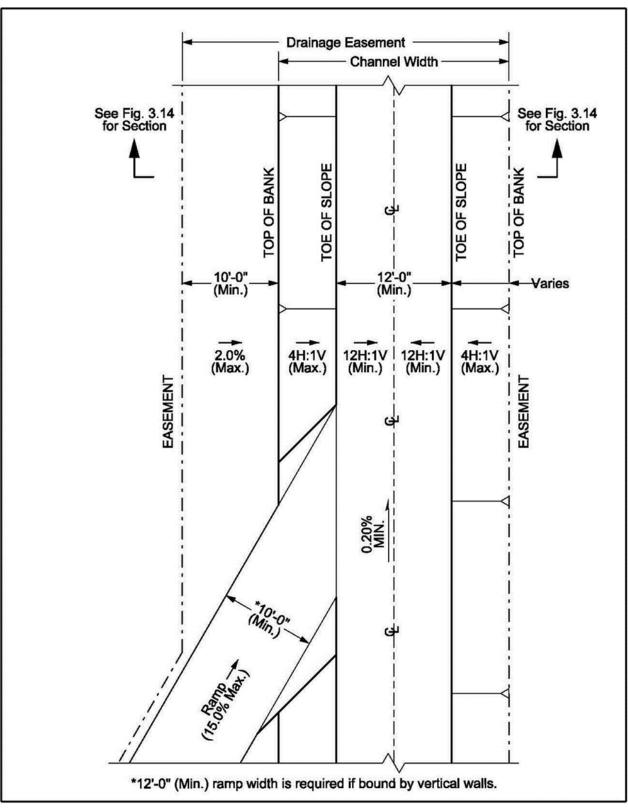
Plan View - Trapezoidal Earthen Channel
